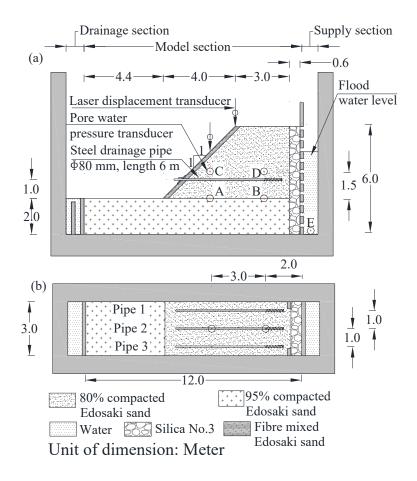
Model Configuration (a) sectional view with geometry and location of sensors (b) plan view (Unit of dimension: meter)
